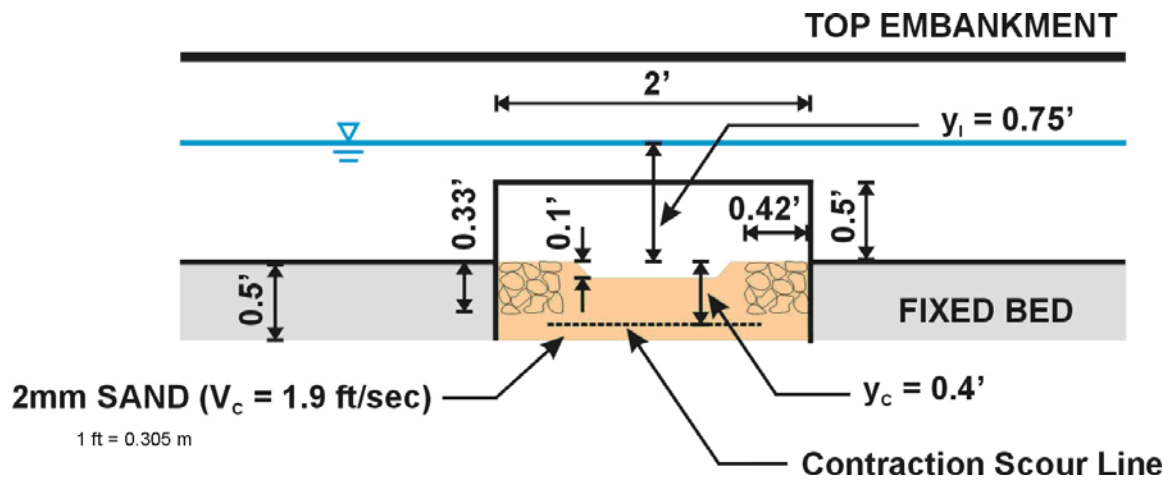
Diagram. Countermeasure installation for MDSA Standard Plan (Section A-A from figure 46).
